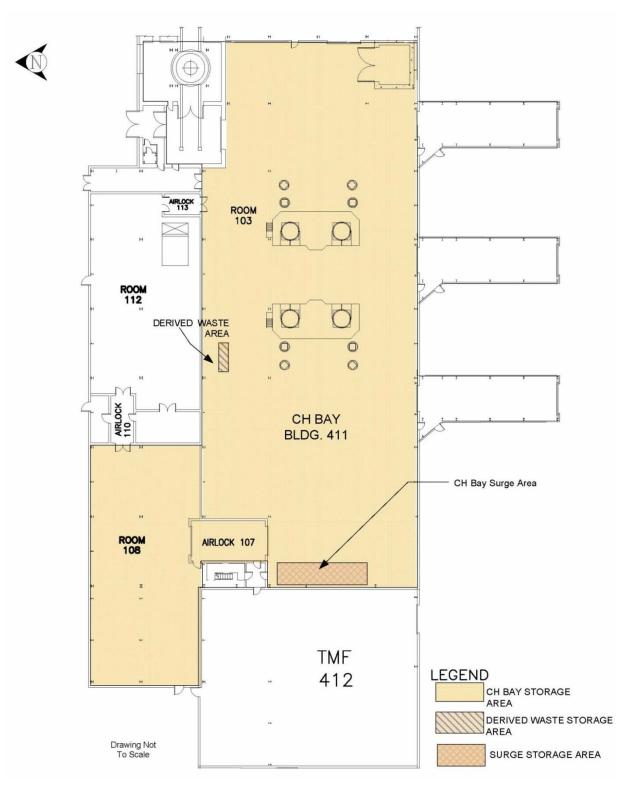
Waste Handling Building - CH TRU Mixed Waste Container Storage and Surge Areas
